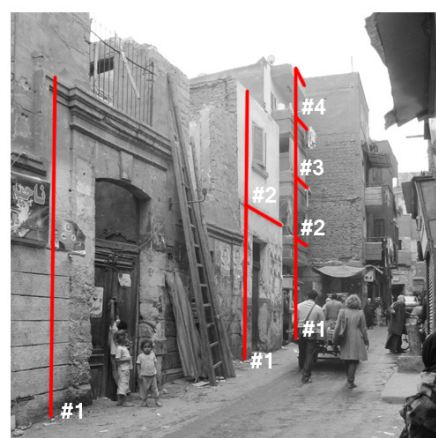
, 65b) Explanatory diagram to assist in determining building height; without considering basements, added elements such as pigeon towers, balusters or constructions that partly occupy the roof surface.
